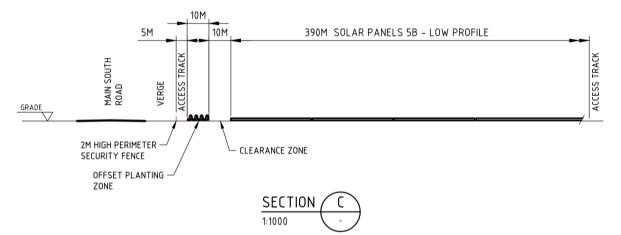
Cross section 'C' (facing north) for Happy Valley Reservoir solar PV layout. Demonstrating 5B profile against proposed landscaping (post pine removal), with Main South Road at Left Hand Side. Excerpt from Appendix B- Design Drawings
